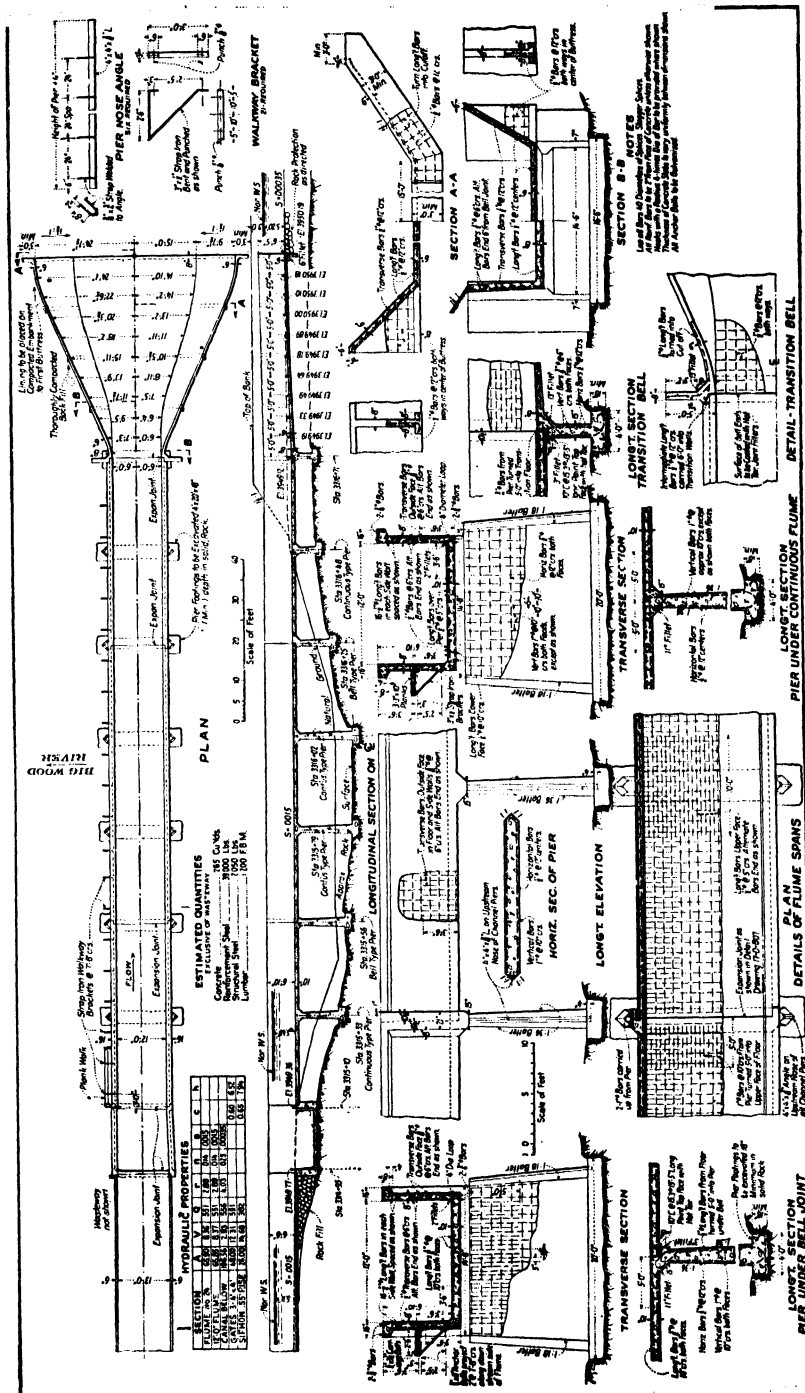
Reinforced concrete aqueduct over Big Wood River, Minidoka project, Idaho.
